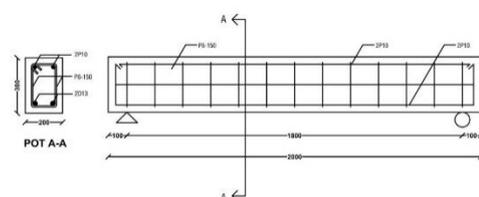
Detail reinforcement of RC beam without rebar splicing (CB)
